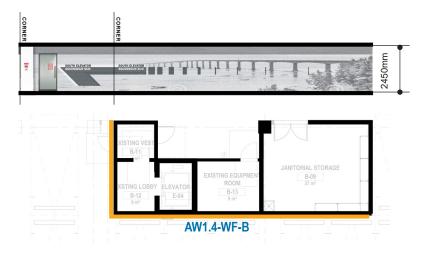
#### Detail N.T.S. Wall-mounted Acrylic Digital Printed Film over concrete blocks, Opaque.
